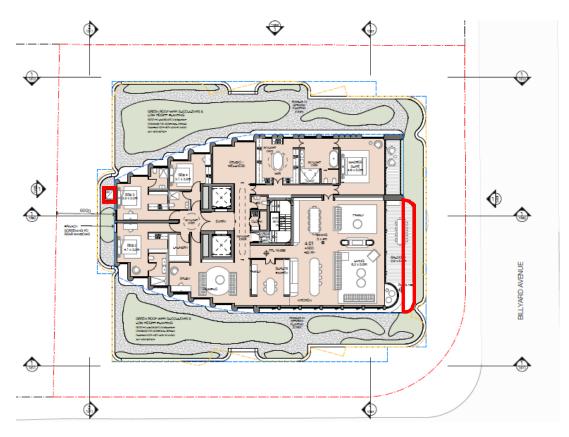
Proposed Fourth Floor Plan (balcony extension and air-conditioning units located outside building envelope of existing consent highlighted in solid bold red)
